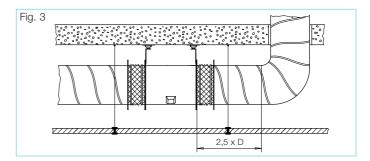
shows the typical installation for use as ventilation technology. The installation of AMD/AMW systems on ceilings is possible by way of direct suspension using mounting brackets (MK) and vibration dampers (accessories SDD, SDZ). The ducting casing with flanges on both sides (according to DIN 24155 page 3) is designed for direct installation in the ducting.
